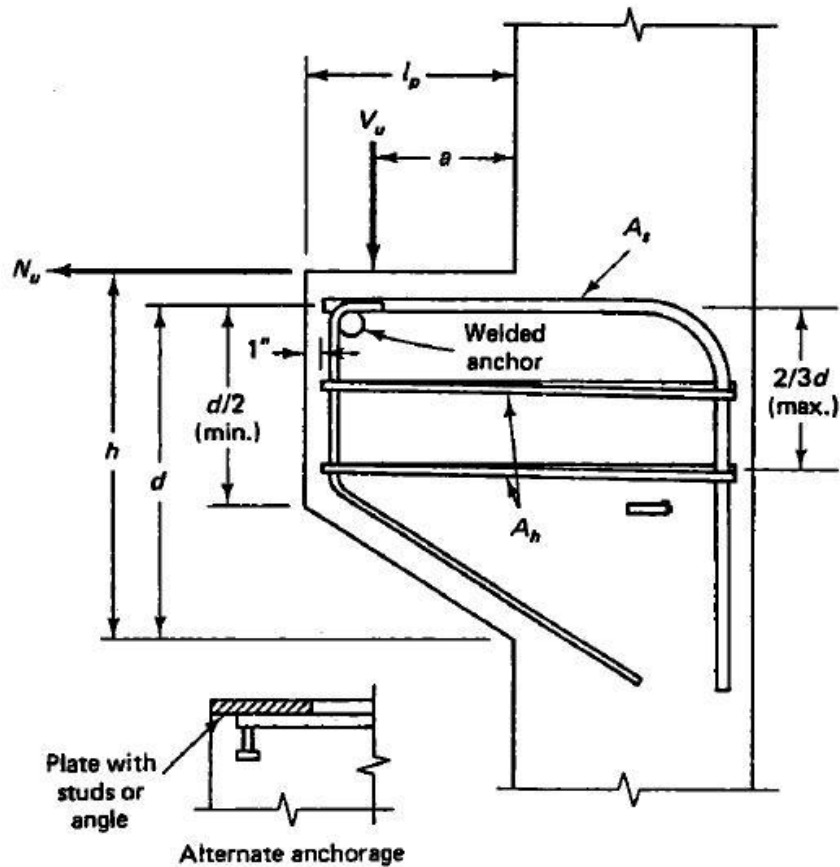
Typical corbel reinforcing details (see also Example 5.7.).
